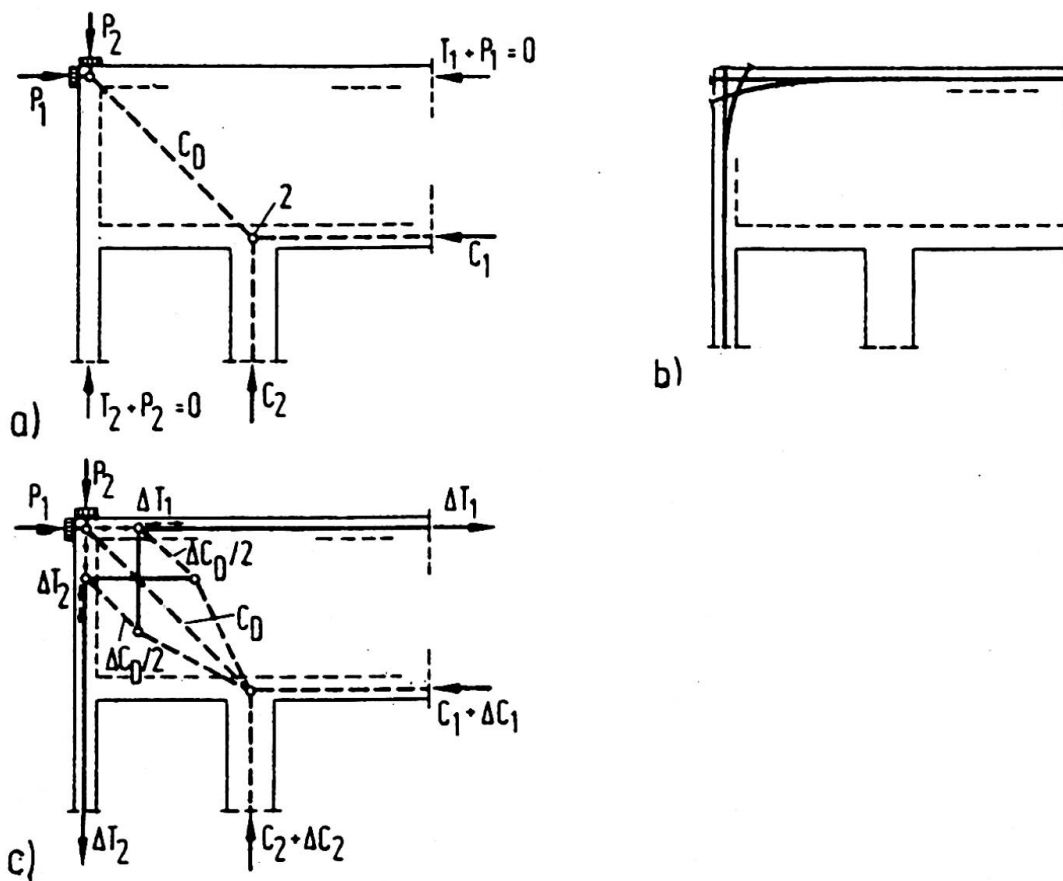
Prestressed structure without internal diaphragm wall a) Top slab and tension wall prestressed under dead load to give zero concrete stresses. Model showing the load paths. b) Practical reinforcement layout c) Strut-and-tie model for increased loads, prestress as before.
